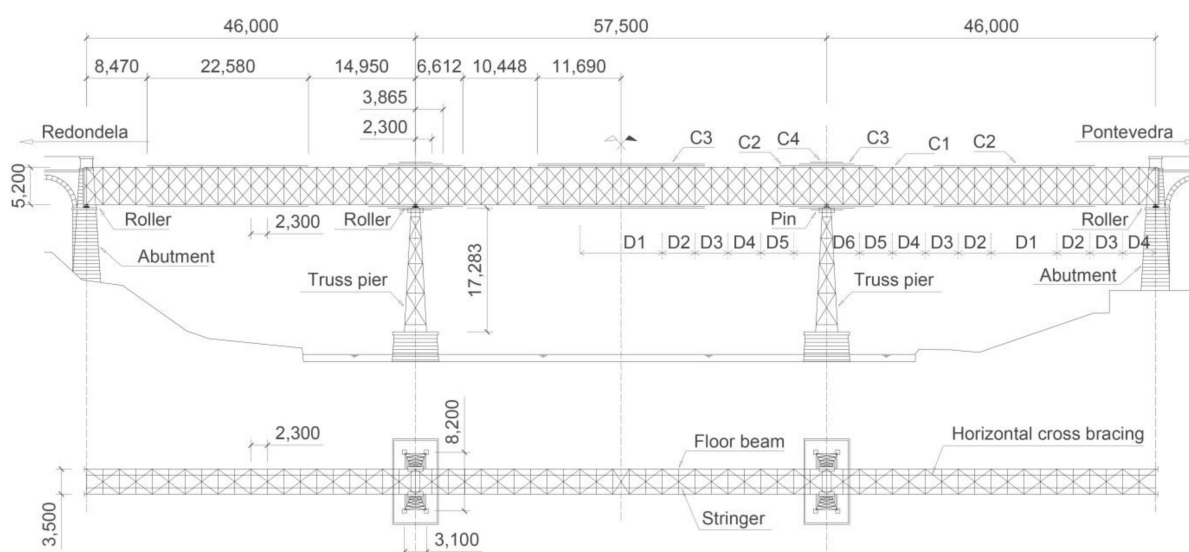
Redondela Bridge drawings: elevation and plan views (all dimensions in mm).
